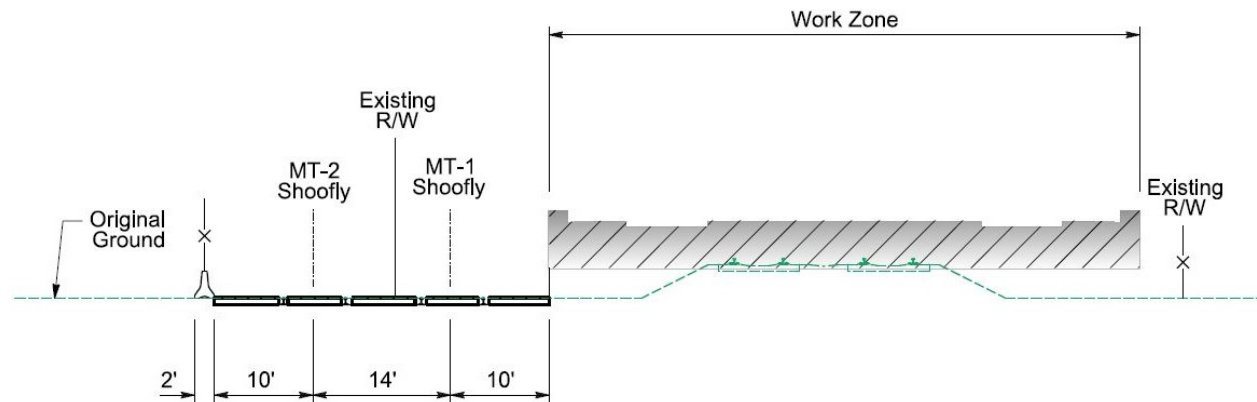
Typical Section of Shoofly Tracks (Looking North)
